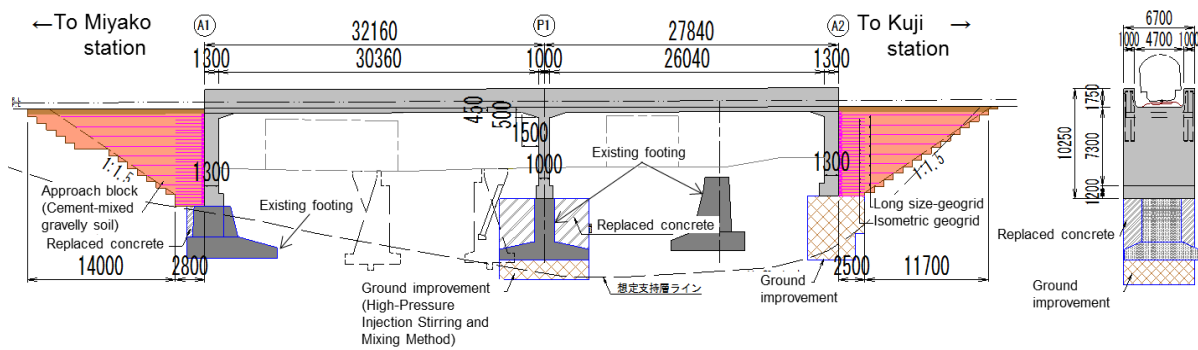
Haipesawa Bridge, Sanriku Railway (all units in mm) (Tatsuoka et al., 2016).
